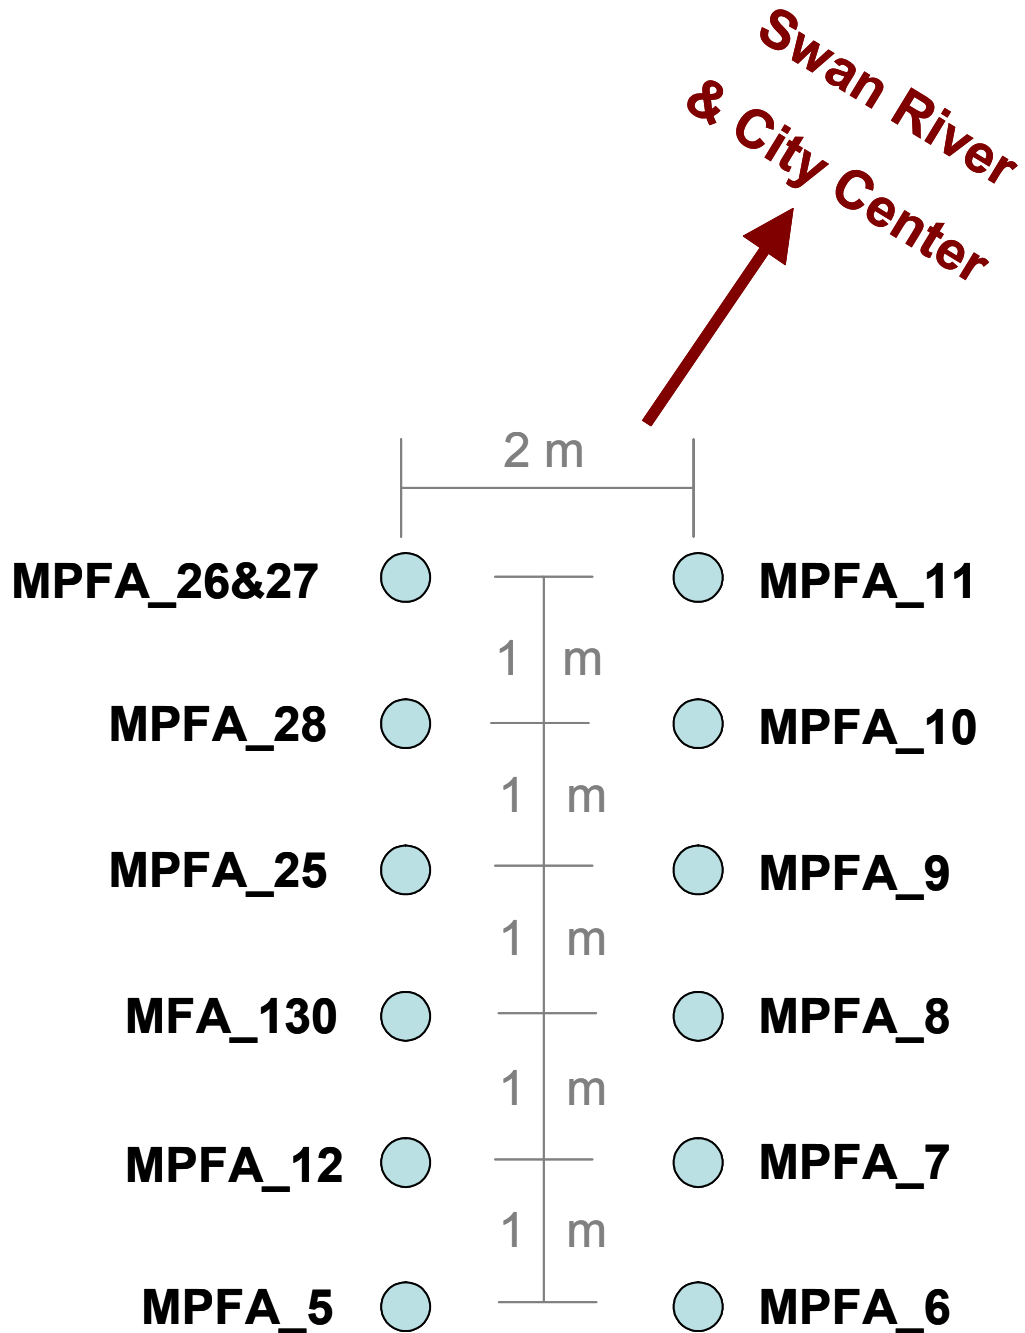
Layout of Sounding Locations for the BWDWA Test Site.
